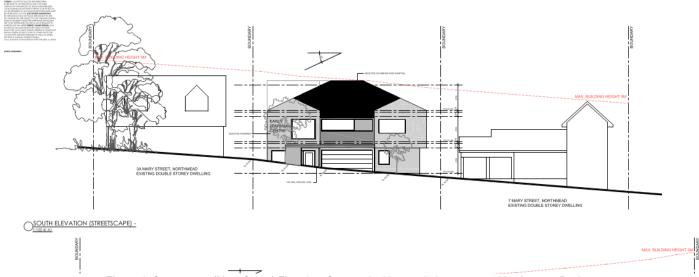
Streetscape (Mary Street) Elevation. Source: Architectural plans prepared by Janssen Designs.
